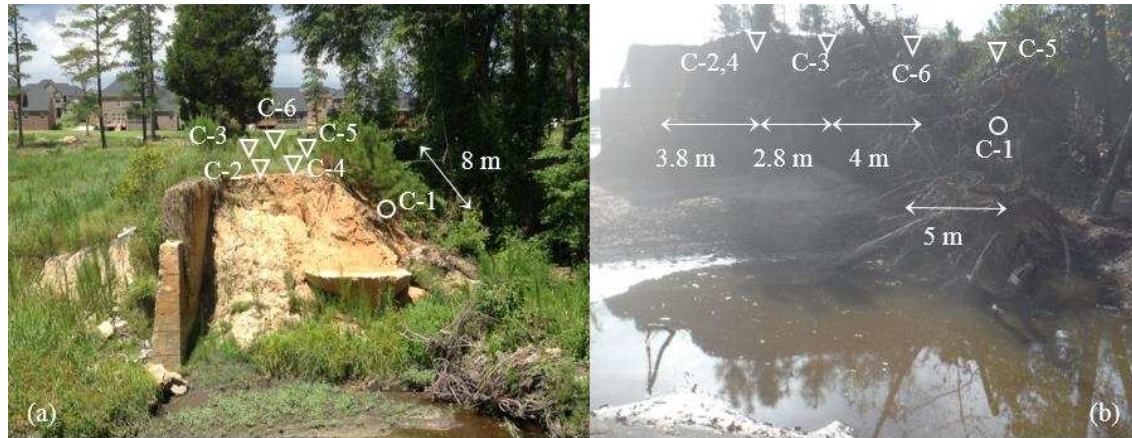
Sampling locations for Dam C: a) northwest view from southeast section of breach, and b) southwest view from downstream (∇ : vertical sample, \circ : horizontal sample).
